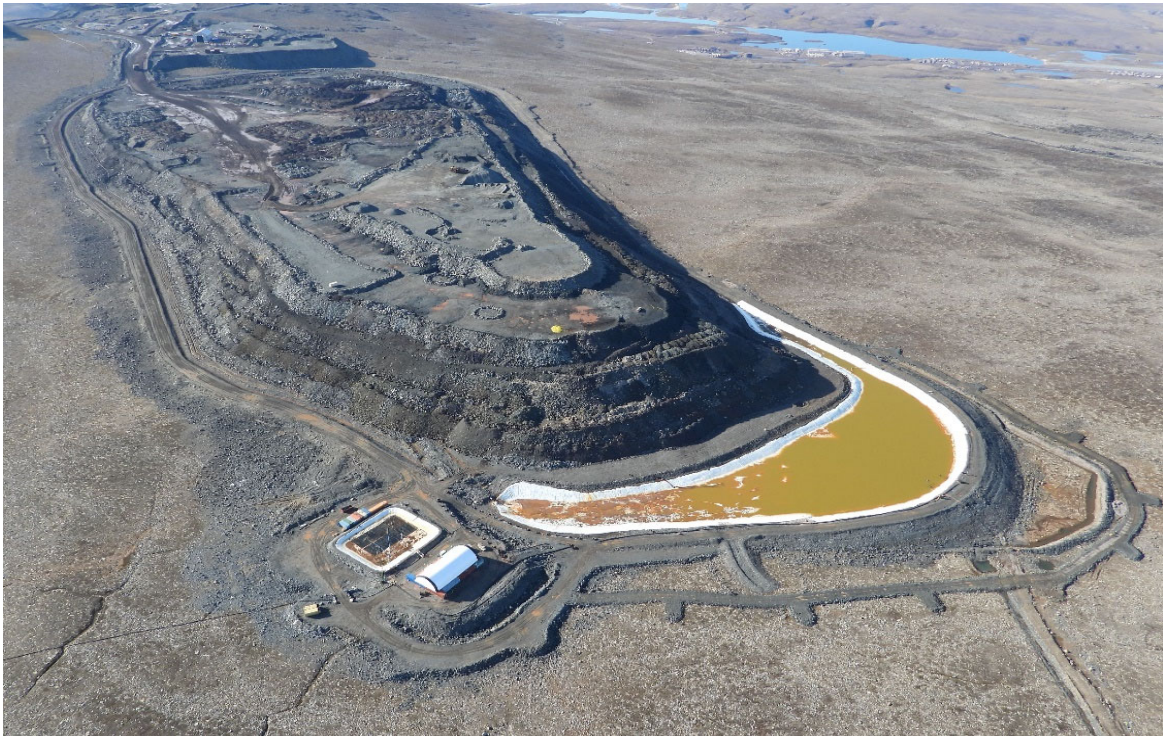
Waste Rock Facility and Surface Water Management Pond (MS-08) – August
